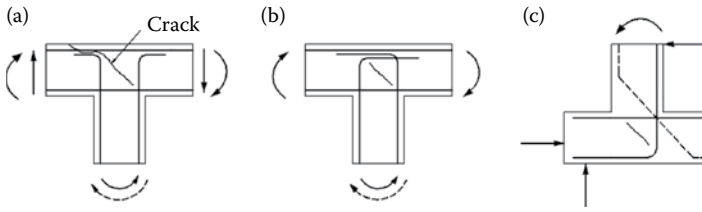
Different details of the tee beam–column connection: (a) unsatisfactory detail, (b) satisfactory detail, and (c) satisfactory detail in case of retaining walls.
